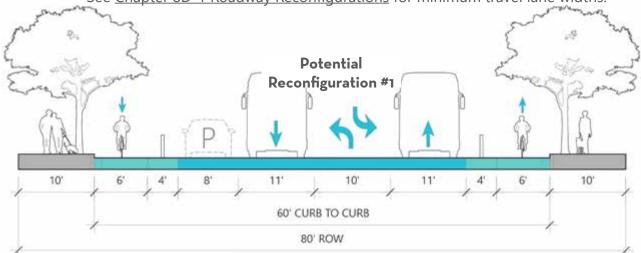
Potential Reconfiguration #1: One-Way, In-Street, Class IV Bikeway on a Downtown Collector Street.
